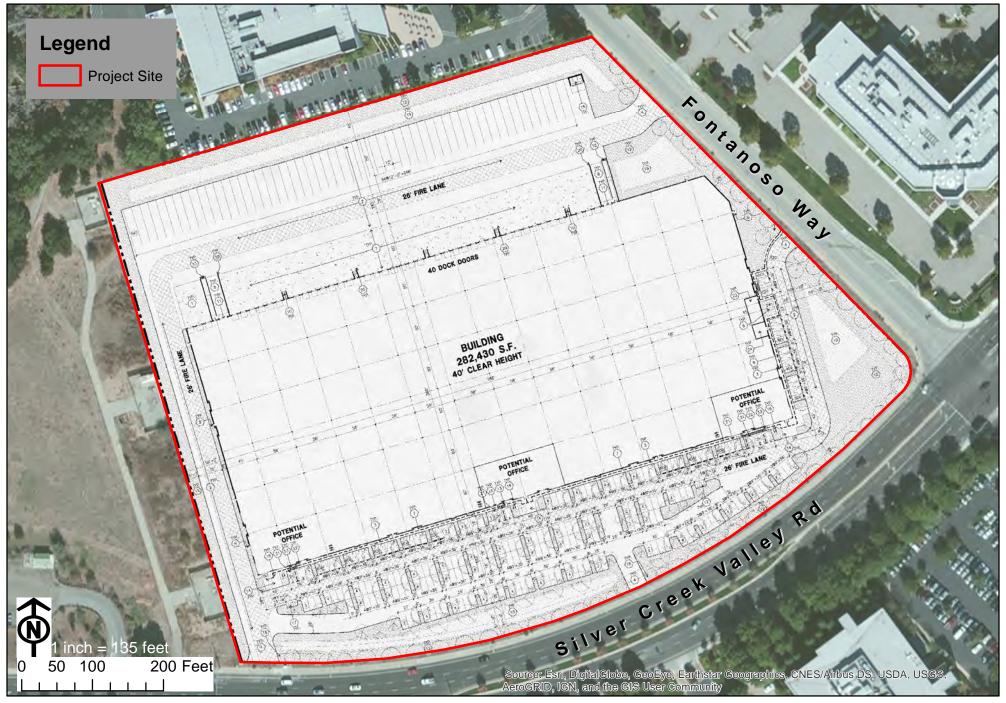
Project Site Plan 5977 and 6001 Silver Creek Valley Road San Jose, County of Santa Clara, CA
